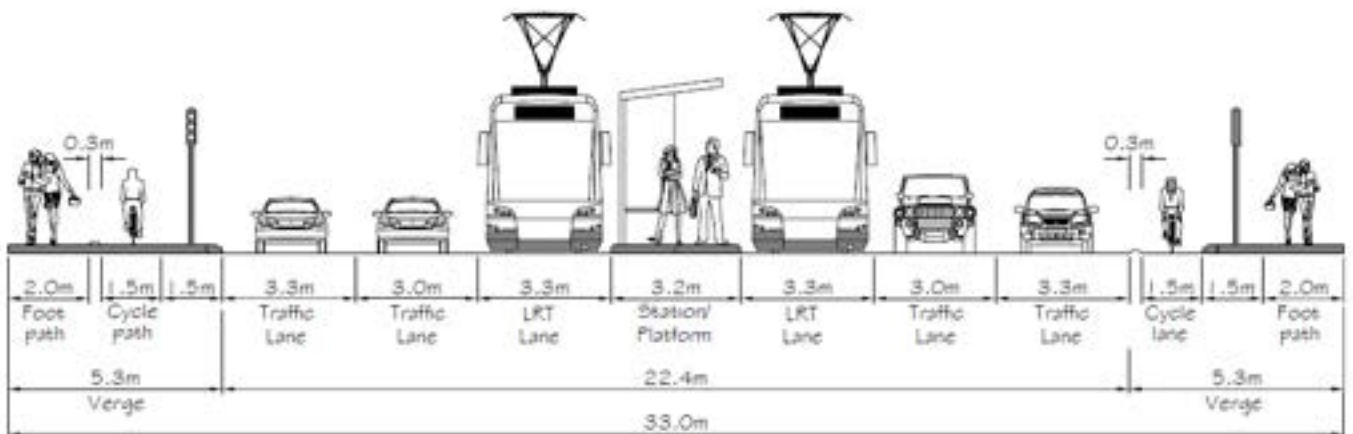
shows cross sections to the north and south of Huntriss Road (A-A and B-B as referenced in Figure 5.7) where a future road width of 33m will be required.
